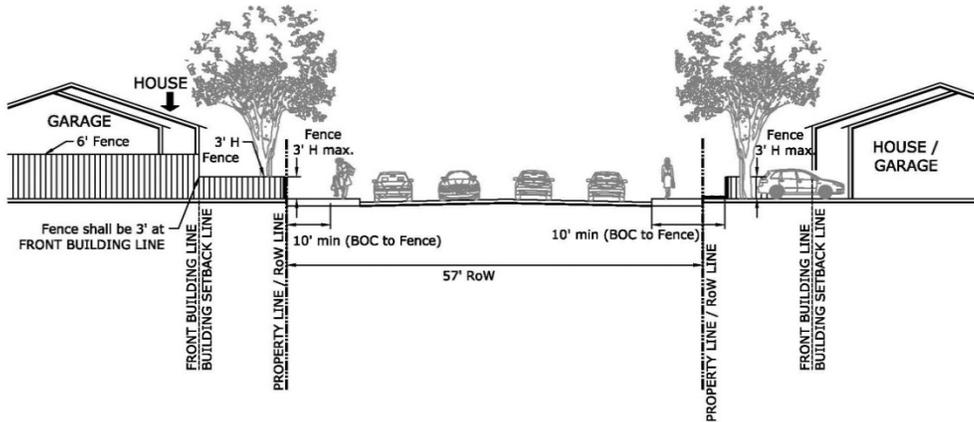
(d) – Typical Cross Section with NO Landscaped Area and Sidewalk
